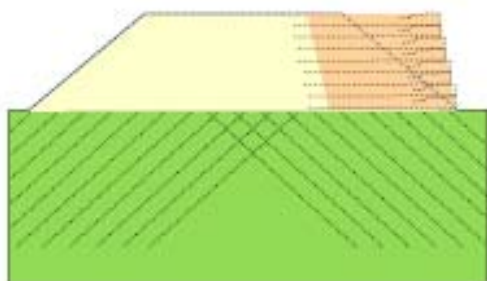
Diagonal drains: reinforcement sub grade and acceleration of drainage
